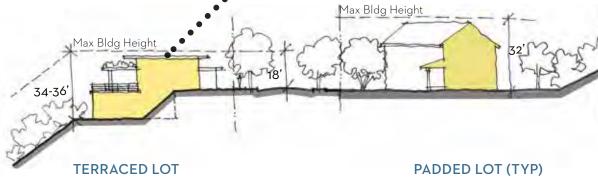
Admiral's Ridge Section and Building Heights by Lot Type
